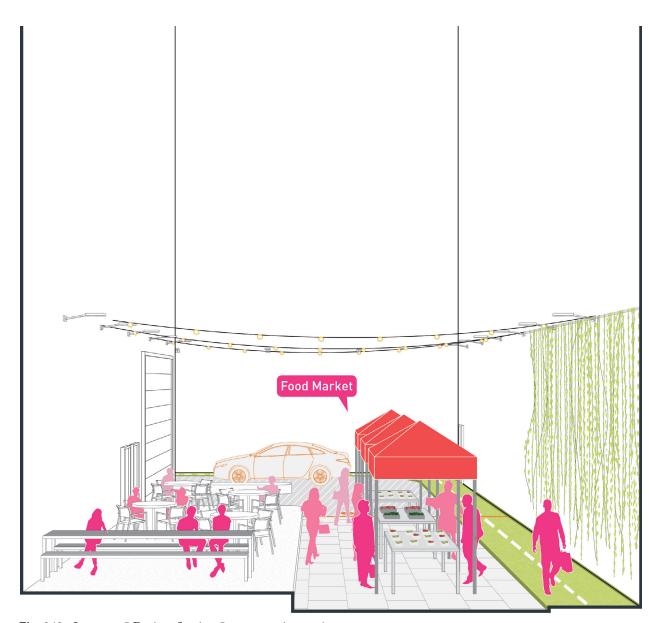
Laneway 5 Design; Section 5a, perspective section
